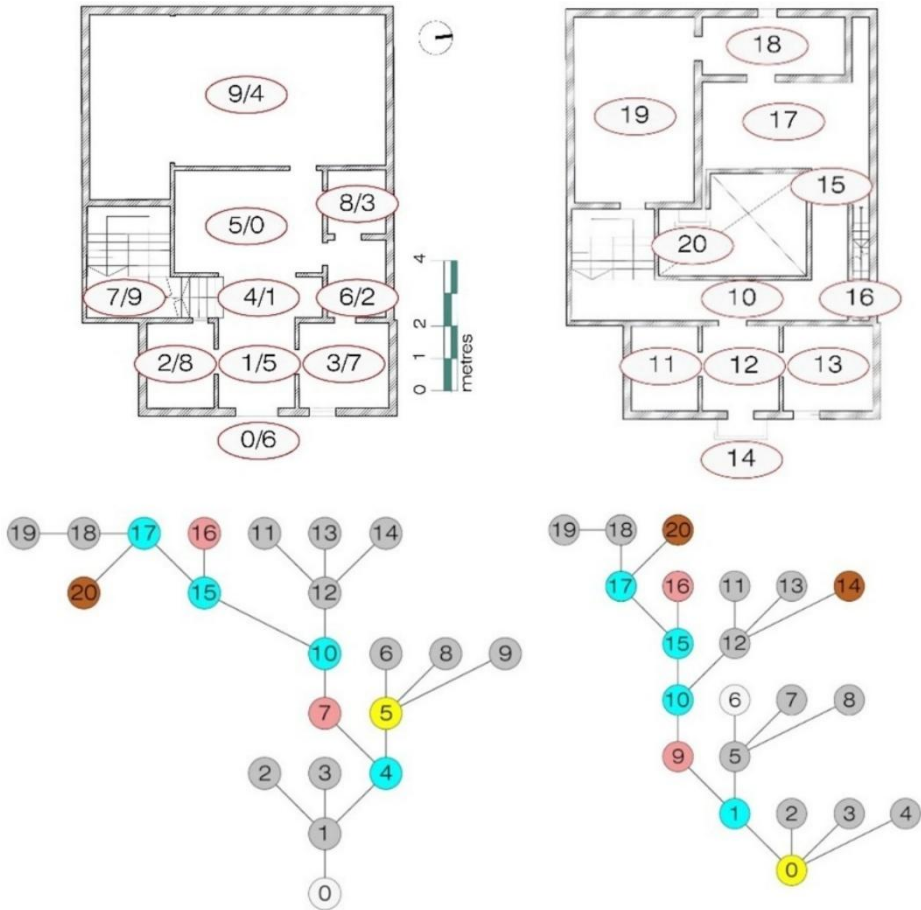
House H20: (top) – (left) ground floor plan, [x/y] refer to movement along the entrance root [x] and the courtyard [y] root, and (right) first floor plan; (bottom) – justified accessibility graph for (left) entrance root and (right) courtyard root.
